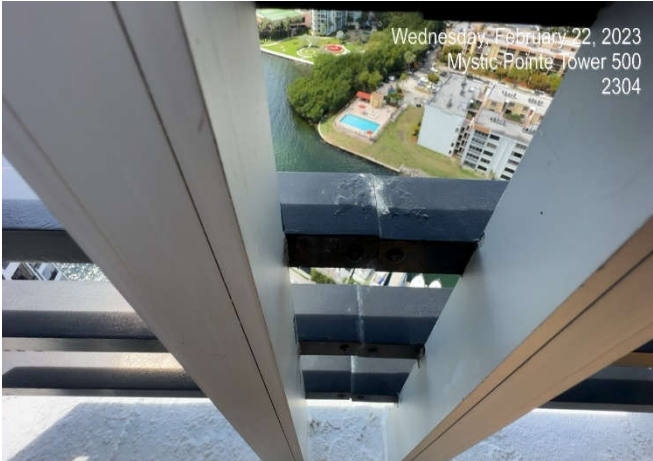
Pitting at balcony railing horizontal pickets (Unit 2304)
